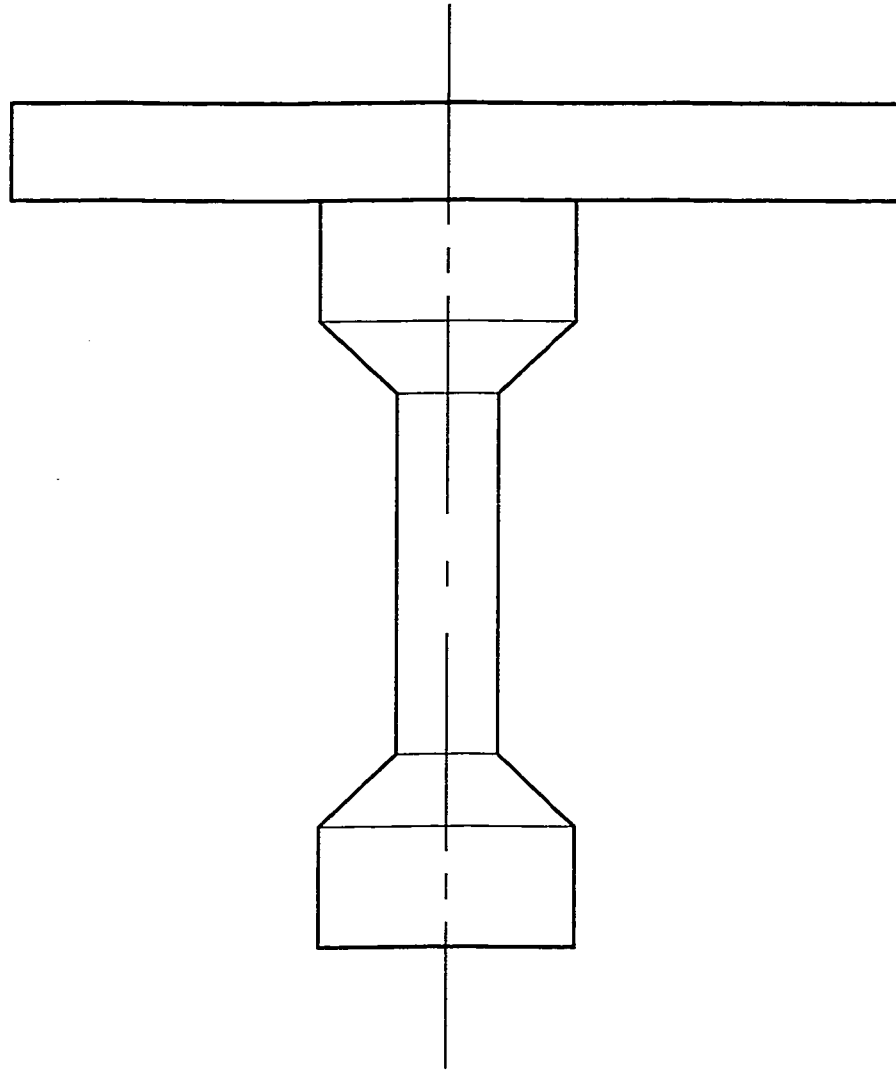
Division of a Concrete Section into Trapeziums and Rectangles
